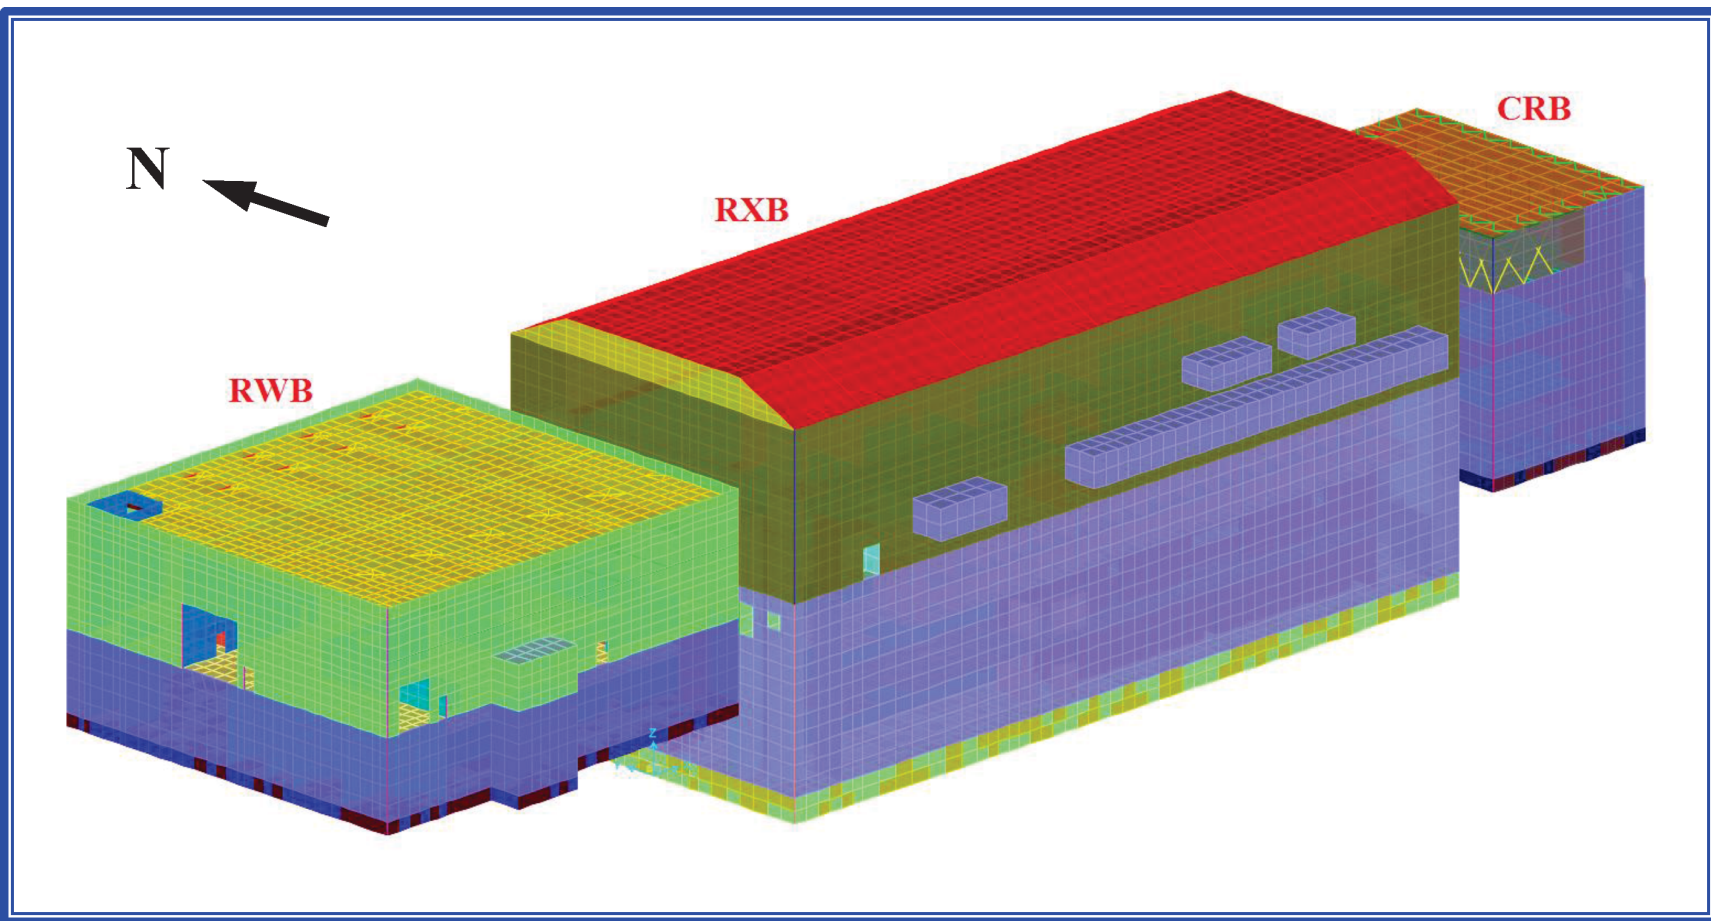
Isometric View of South Side of Triple Building SAP2000 Model (Looking Northwest)
